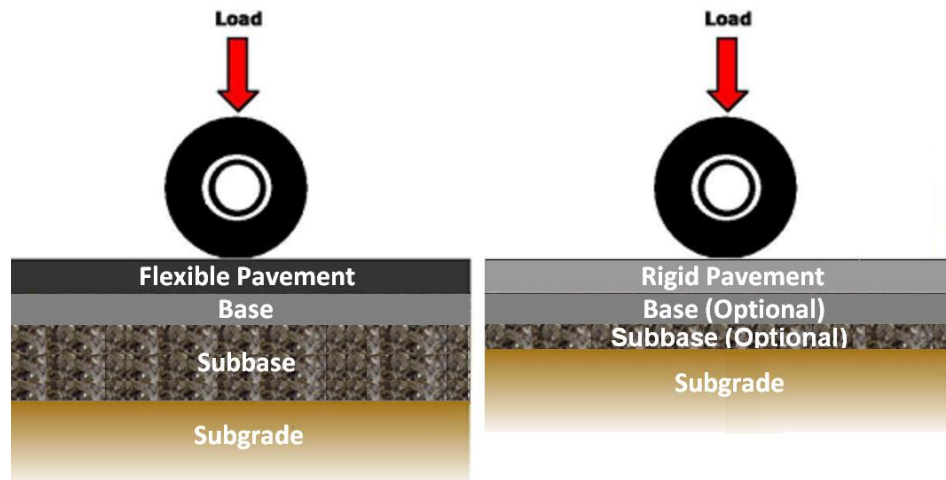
(a) Flexible pavement; (b) Rigid pavement
